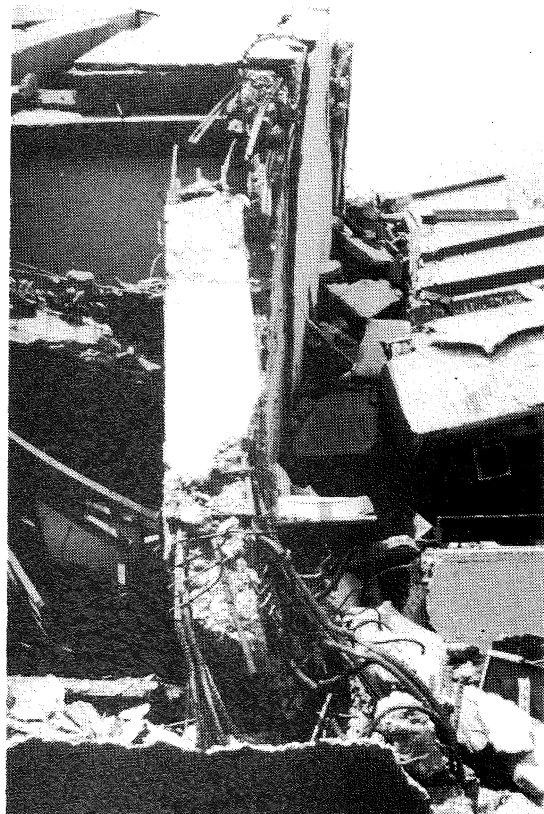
Tower block, Hyatt Terraces Hotel, Baguio; torsion/tension splice failure of column element at end of shear wall
